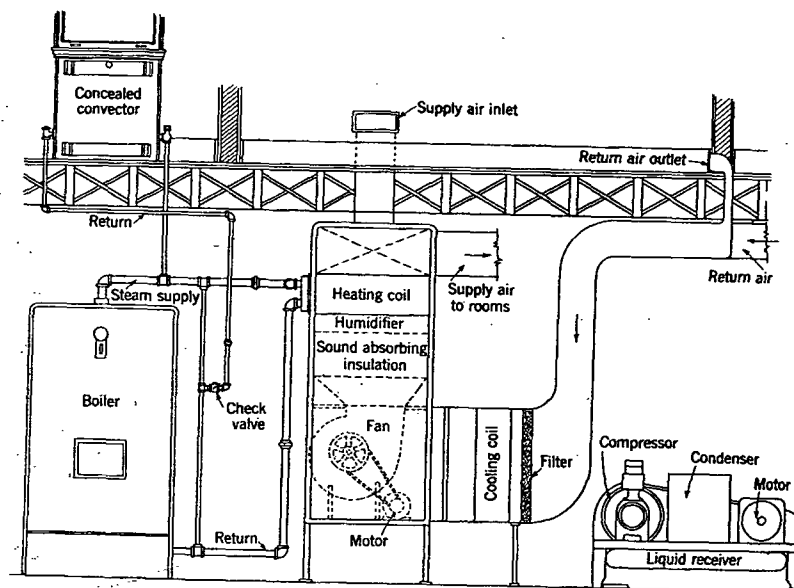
RESIDENTIAL CONDITIONING UNIT WITH STEAM BOILER
